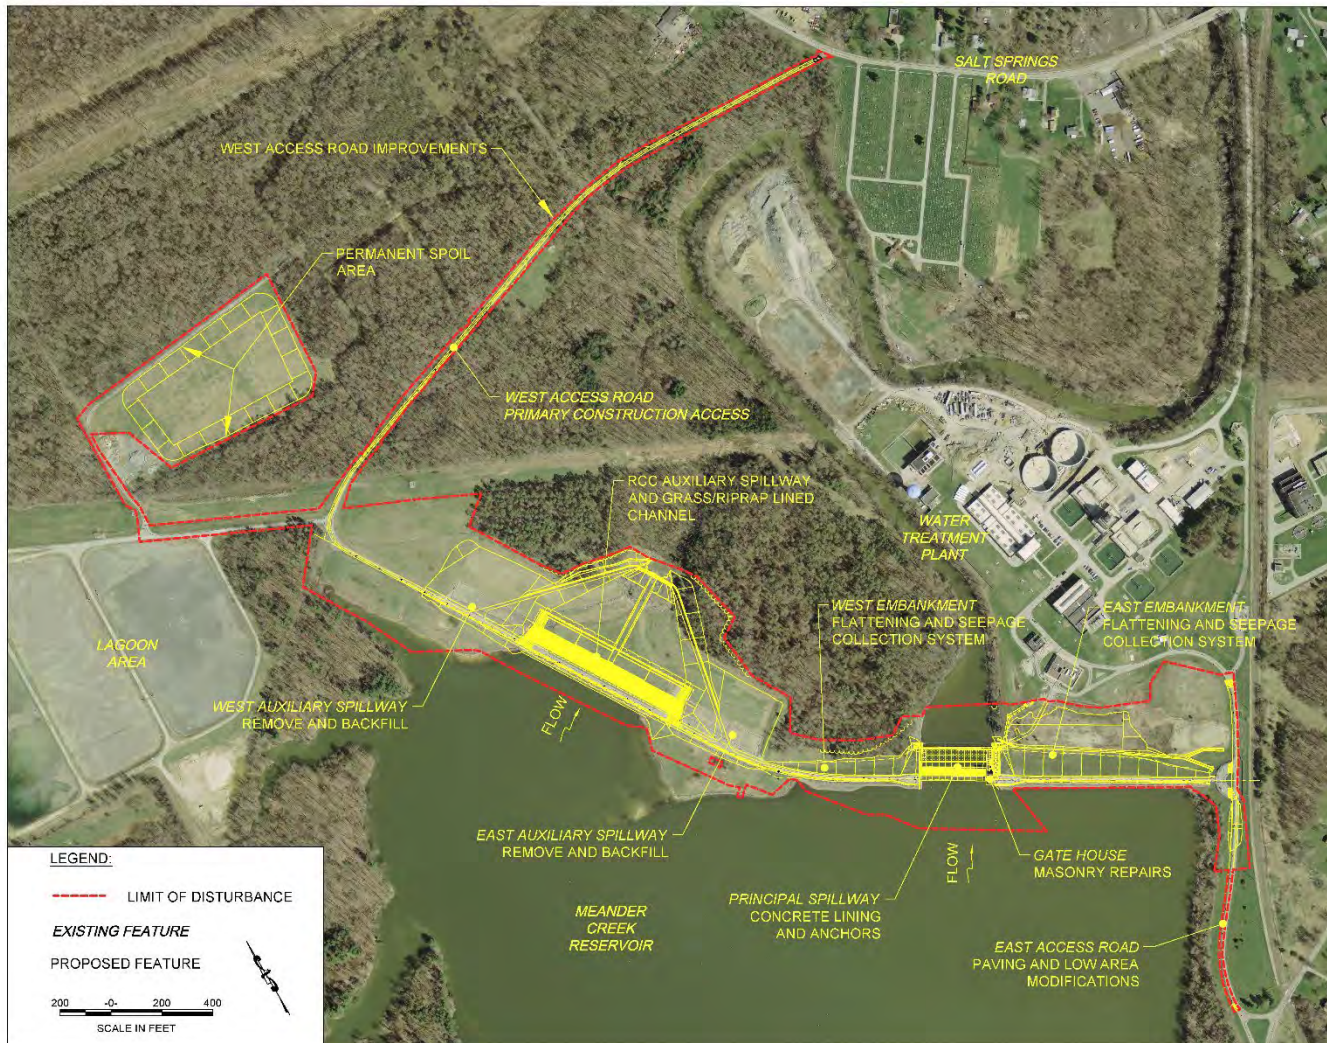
Mineral Ridge Dam Existing and Proposed Features
